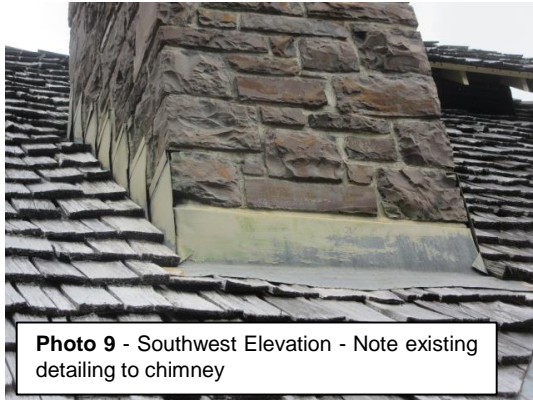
Southwest Elevation - Note existing detailing to chimney
